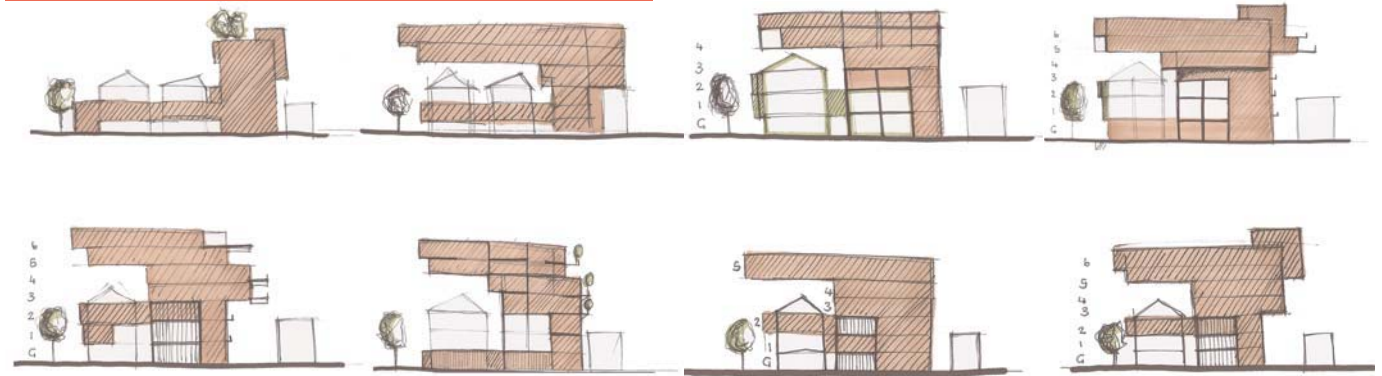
Series of sections through the site illustrating possible configurations of new versus old construction
